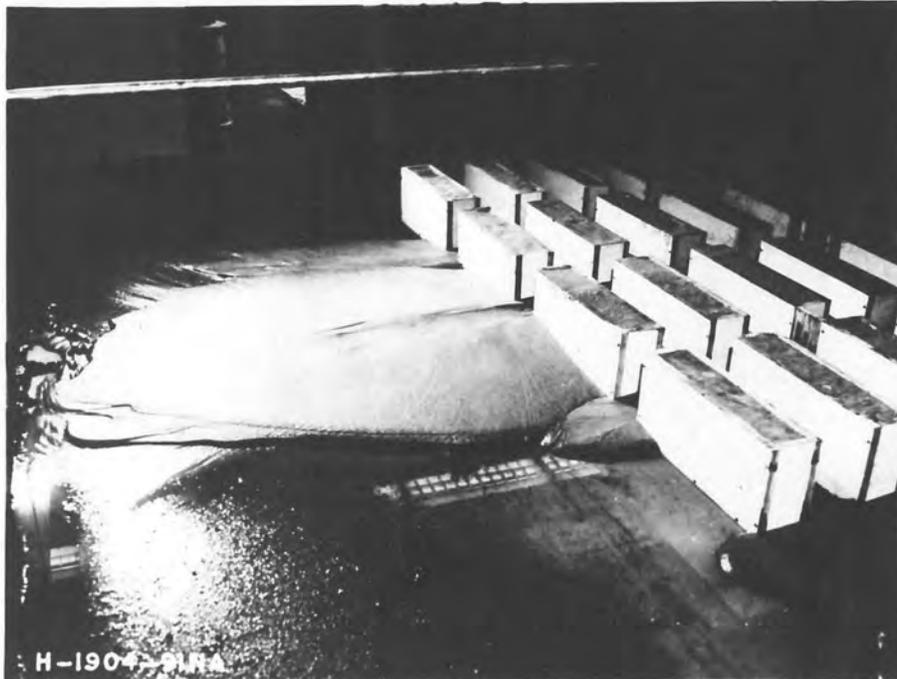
Test 10. Deposit at edge of pillar area shows slope of deposited backfill material for Test 10 conducted in a dry cavity. Bed slope for longitudinal direction of pillars and corridors was 0.050. Bed slope in transverse direction to pillars was 0.062.
